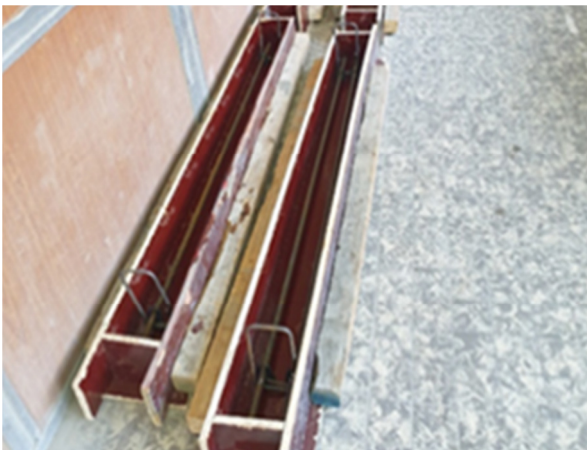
The wooden mold and reinforcing steel cage for composite beams.
